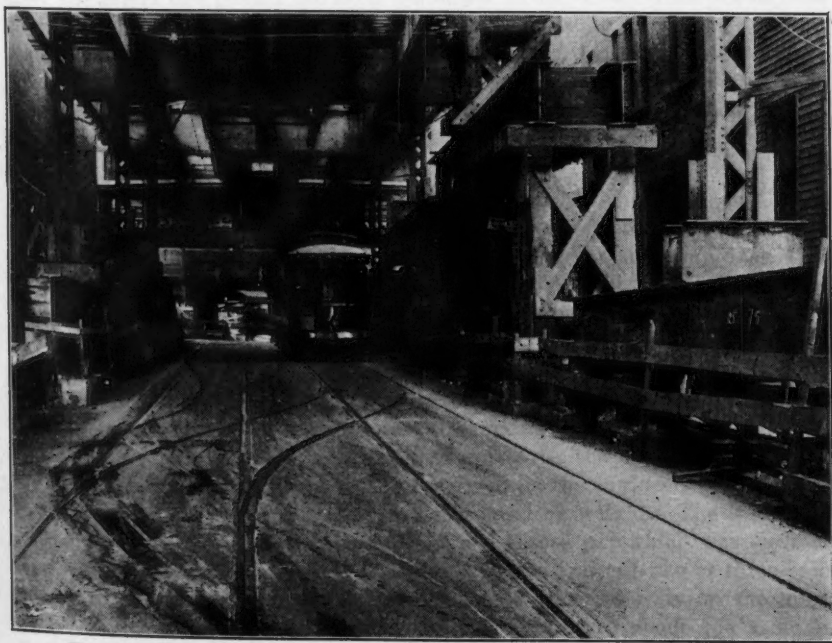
SHORING UNDER ELEVATED RAILWAY ON HIGH STREET, BROOKLYN.
